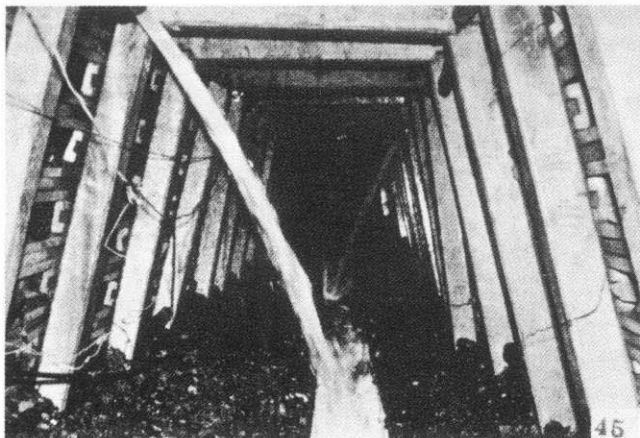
Discharged water from a drain drilling in a drainage tunnel.
